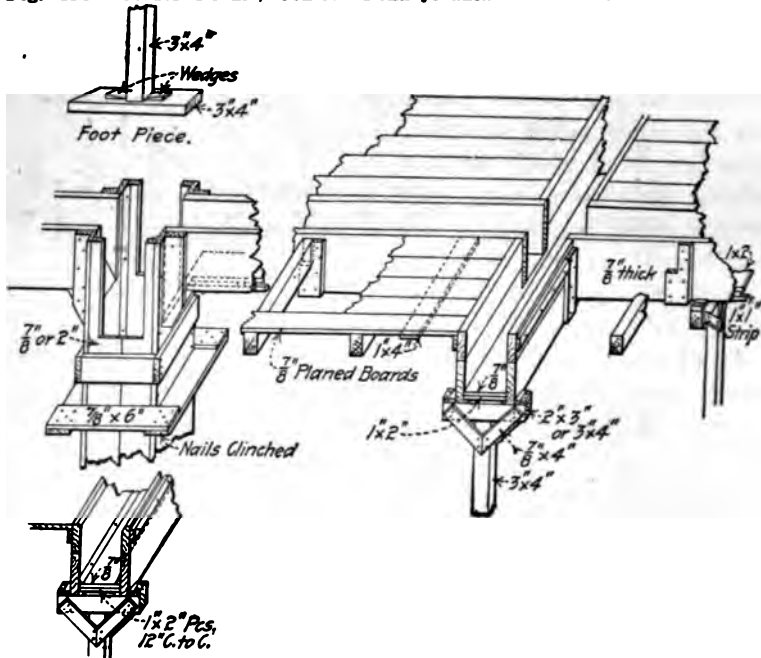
Slab and Girder Floor Forms of Unit Concrete Steel Frame Co. in the construction of an Atlantic City hotel, designed by the Trussed Concrete-Steel Co., Detroit, Mich.
